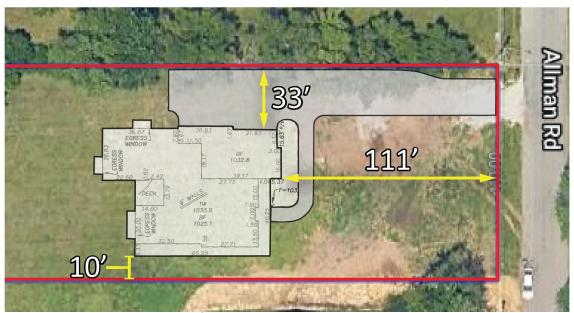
Excerpt of Twilight Acres, 3rd Plat, Lot 1, with the current proposed home build superimposed to illustrate the requested deviation from the south side yard setback requirement.
